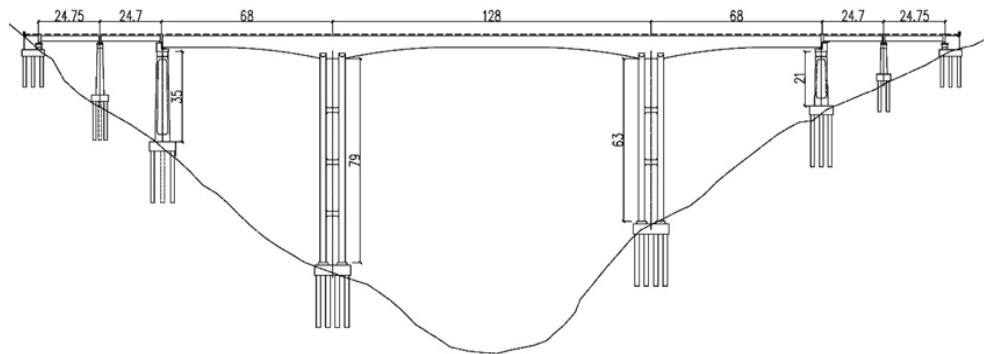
Bridge Span Arrangement of the Downstream Bridge Proposal
